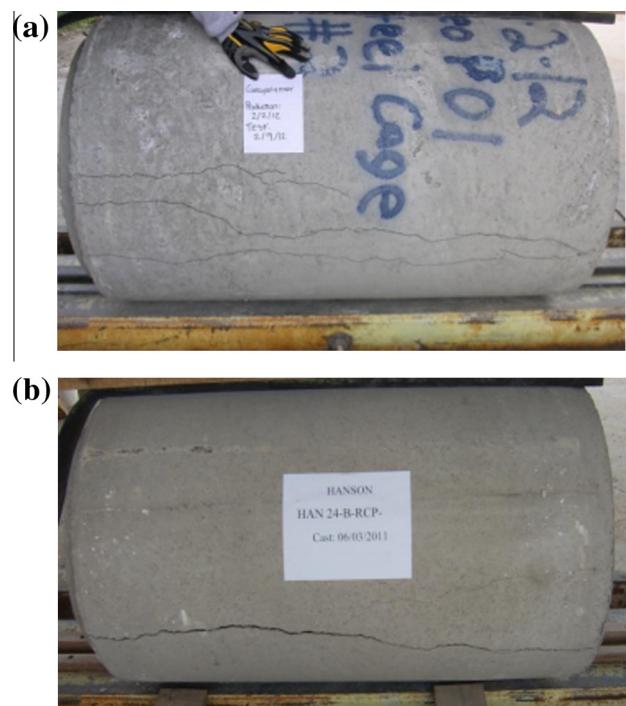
Failure mode of (a) reinforced geopolymer concrete pipe and (b) conventional reinforced concrete pipe [73].
